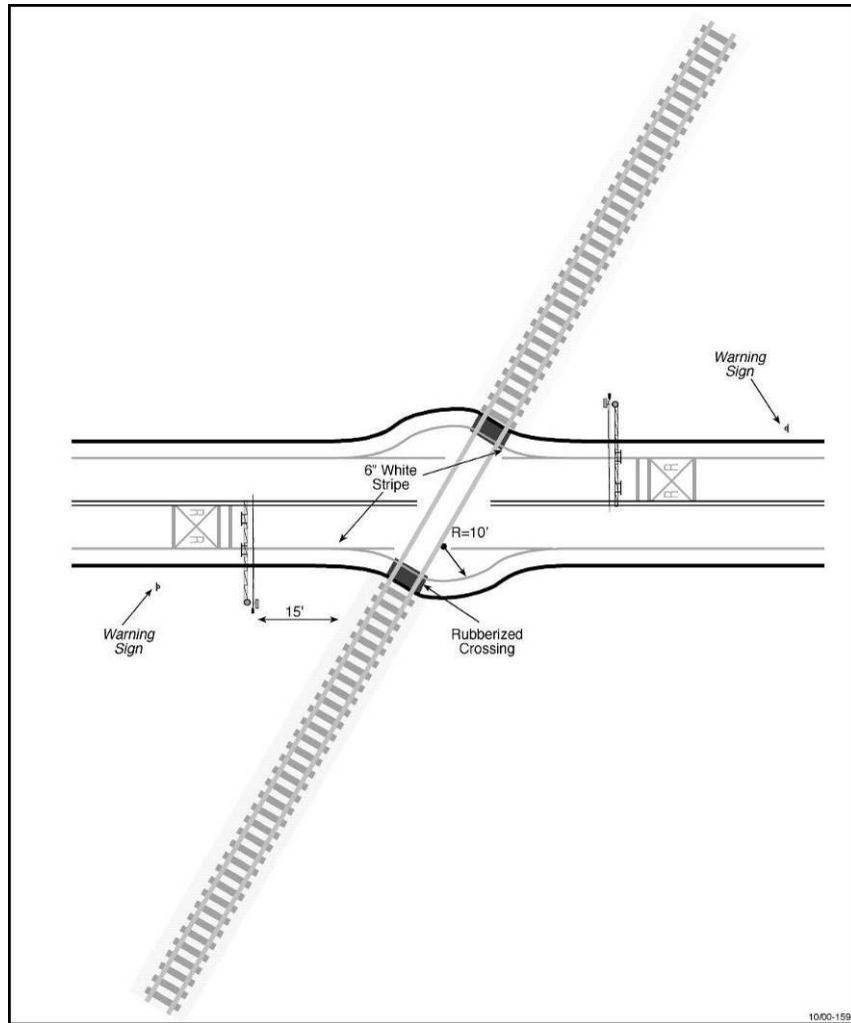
Bike Lanes Crossing at Railroad Tracks
